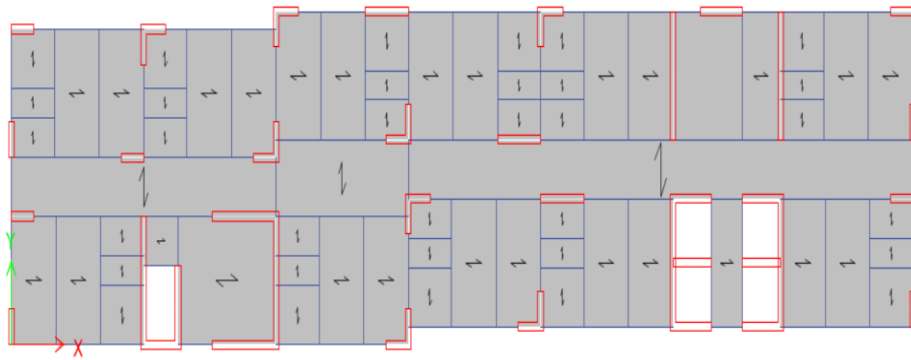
Floor plan of conventional slab system on ETABS 2021
